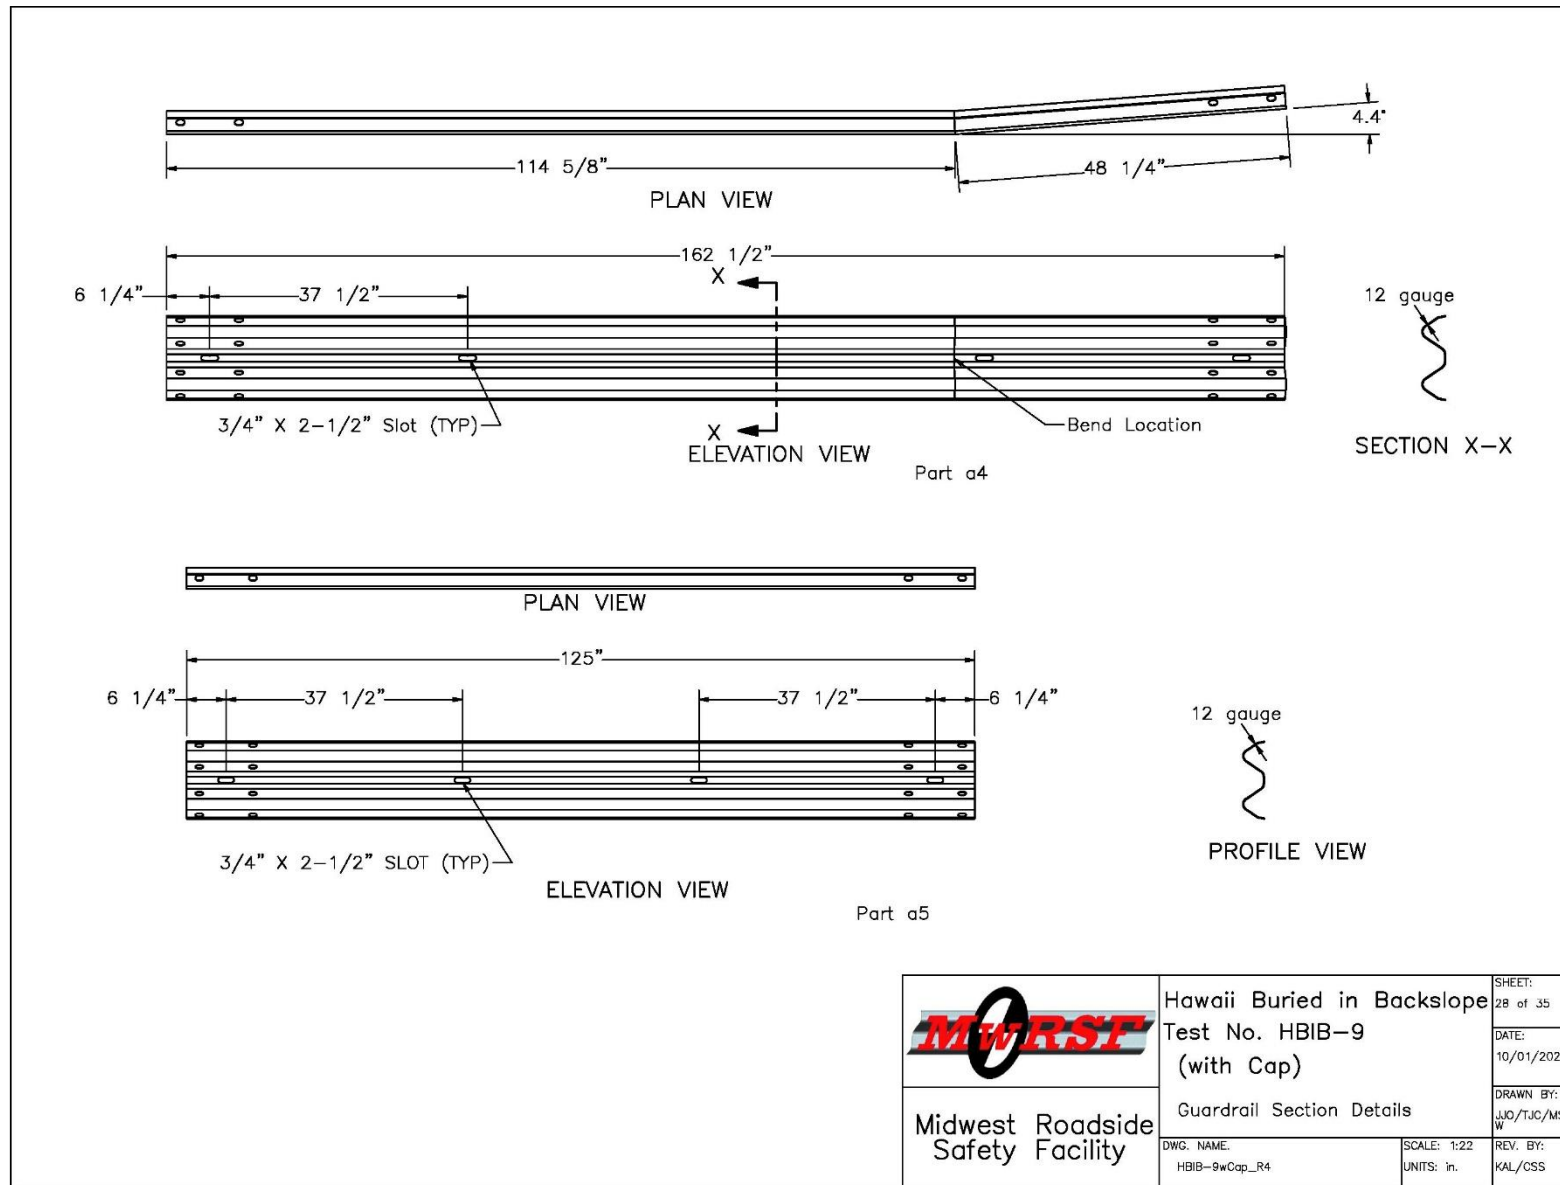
Guardrail Section Details, Cont., Test No. HBIB-9
